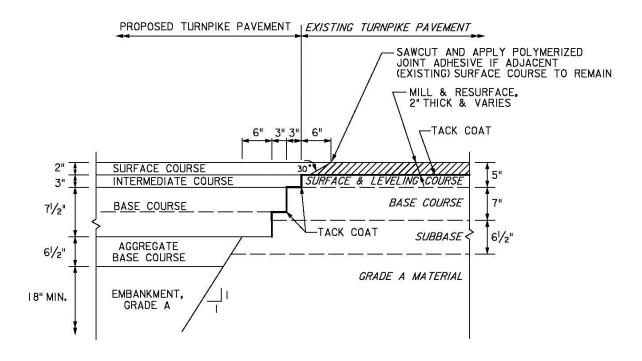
17: TURNPIKE NEW PAVEMENT INTERFACE WITH EXISTING PAVEMENT
